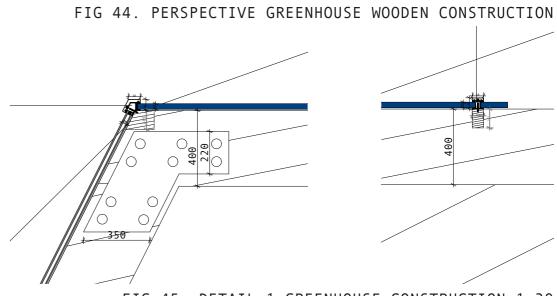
DETAIL 1 GREENHOUSE CONSTRUCTION 1:20
